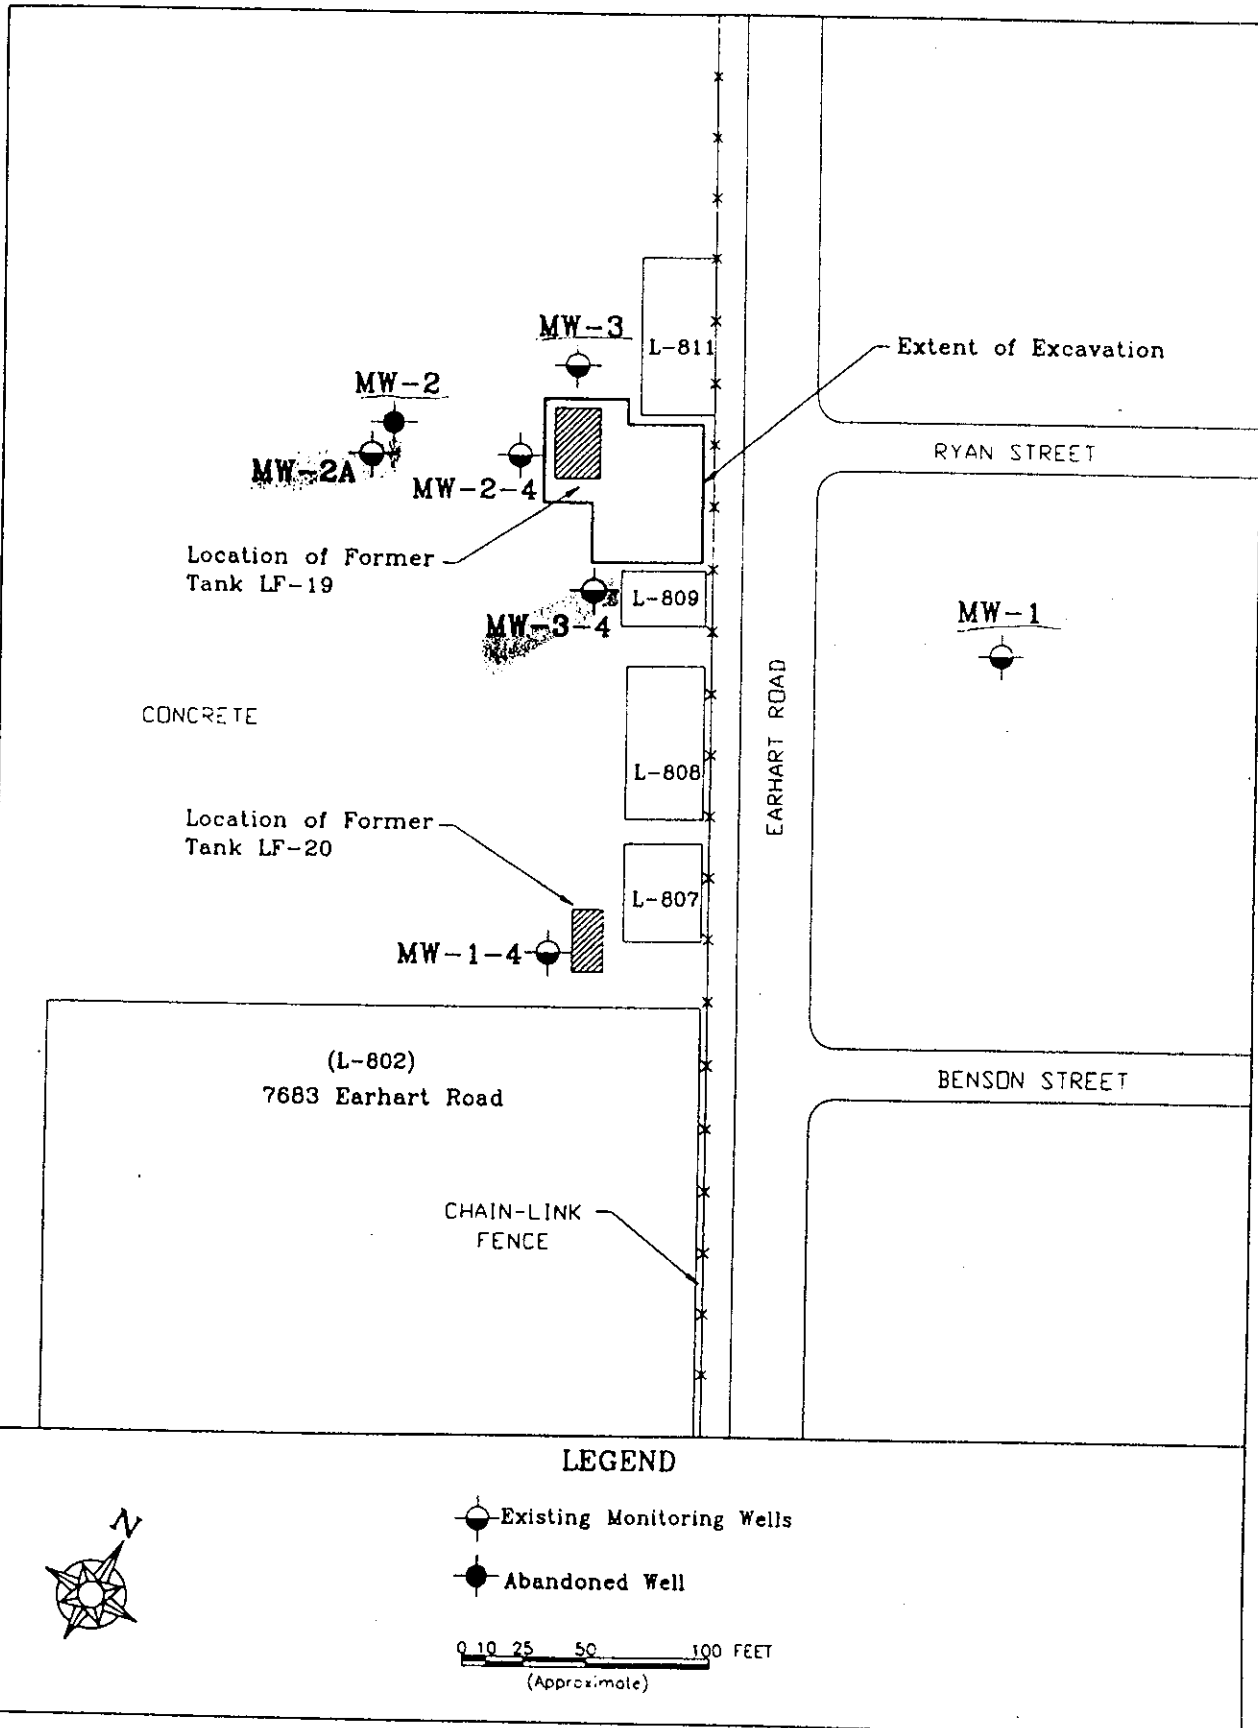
Site Plan of Monitoring Wells at Hangar 9 Complex
